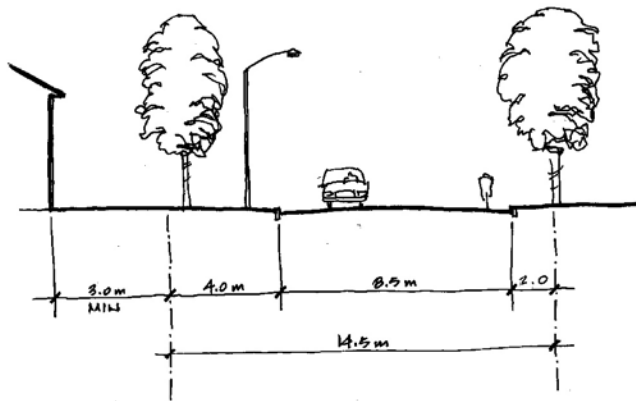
Single-Loaded Road: 14.5 metres ROW (illustration only)
